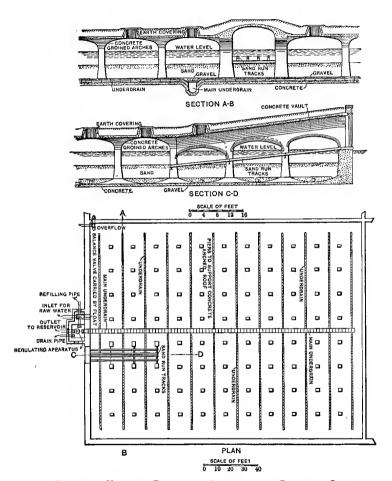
TYPICAL PLAN AND SECTIONS OF COVERED SLOW SAND-FILTER.
